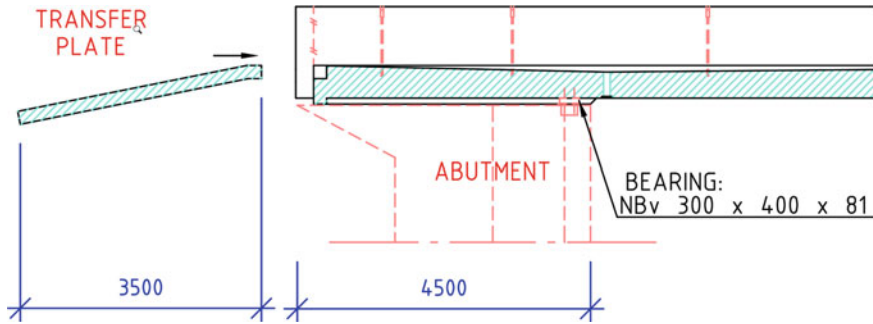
Detail of the connection between the bridge deck, abutment and the transfer plate
